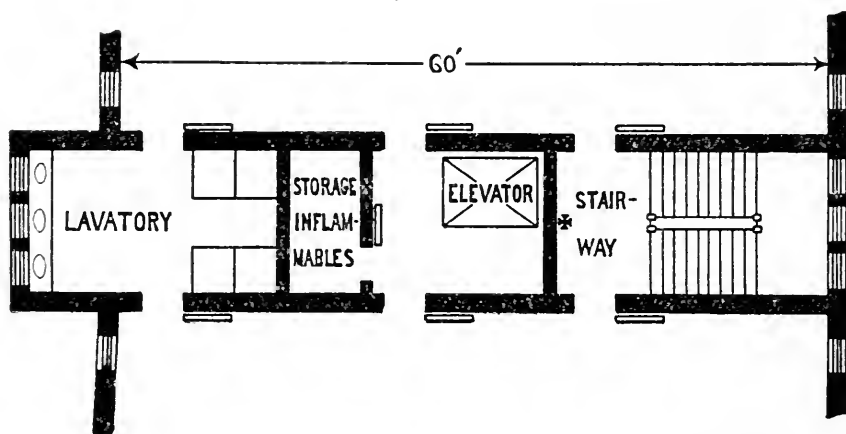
Plan showing the grouping of service centers between fire-proof walls, separating two shops. All doorways protected by self-closing, fire-proof doors. \times = fire plug.
